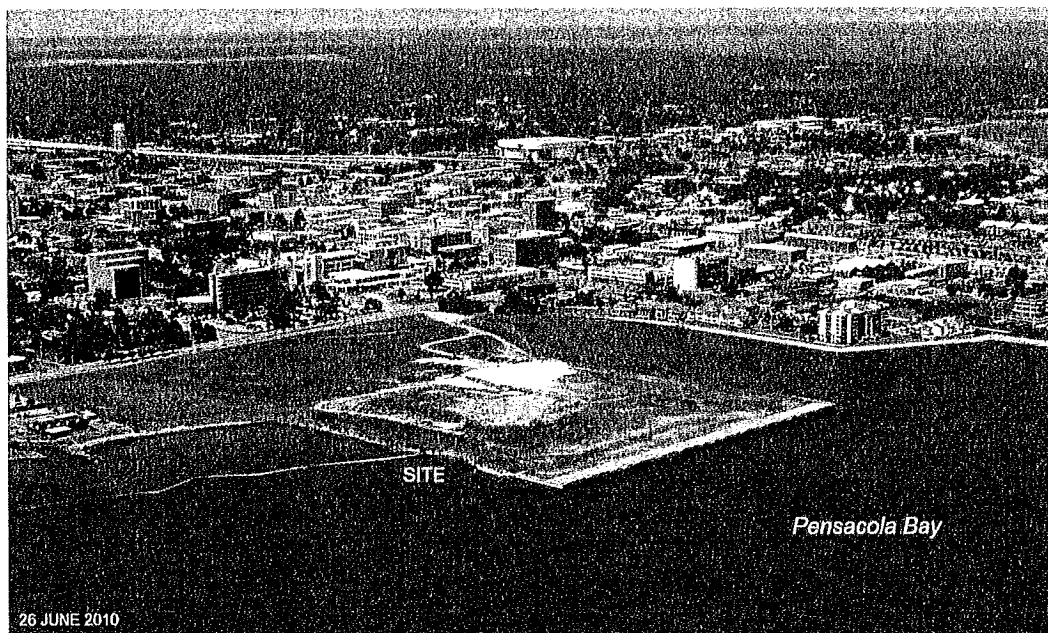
Aerial view of the Pensacola Community Maritime Park site, looking northeast. The proposed marina and breakwater are to be constructed along the west side of the site.
